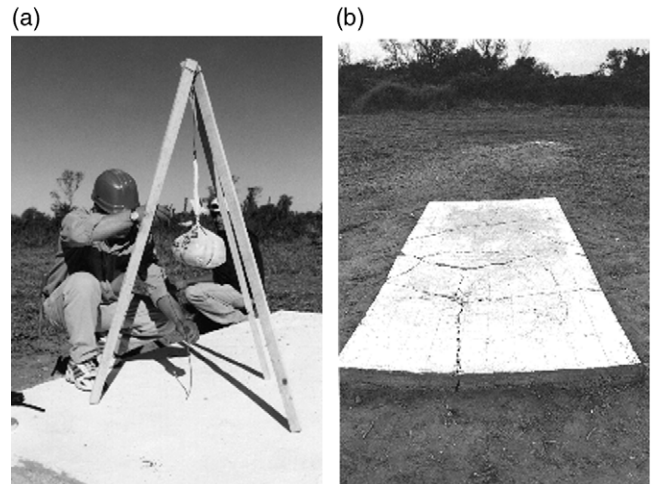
Blast test of a concrete slab. (a) Location of the explosive over the slab, (b) final damage pattern.
